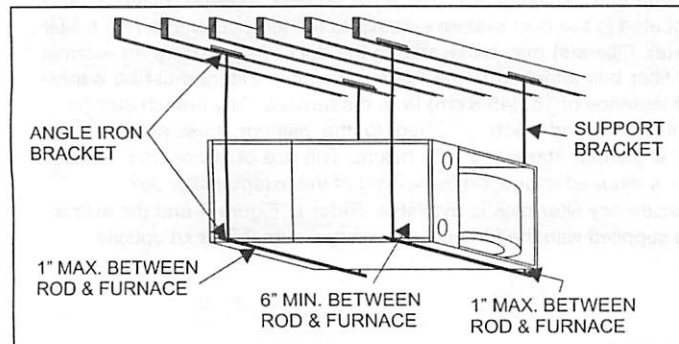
Typical Suspended Furnace / Crawl Space Installation
